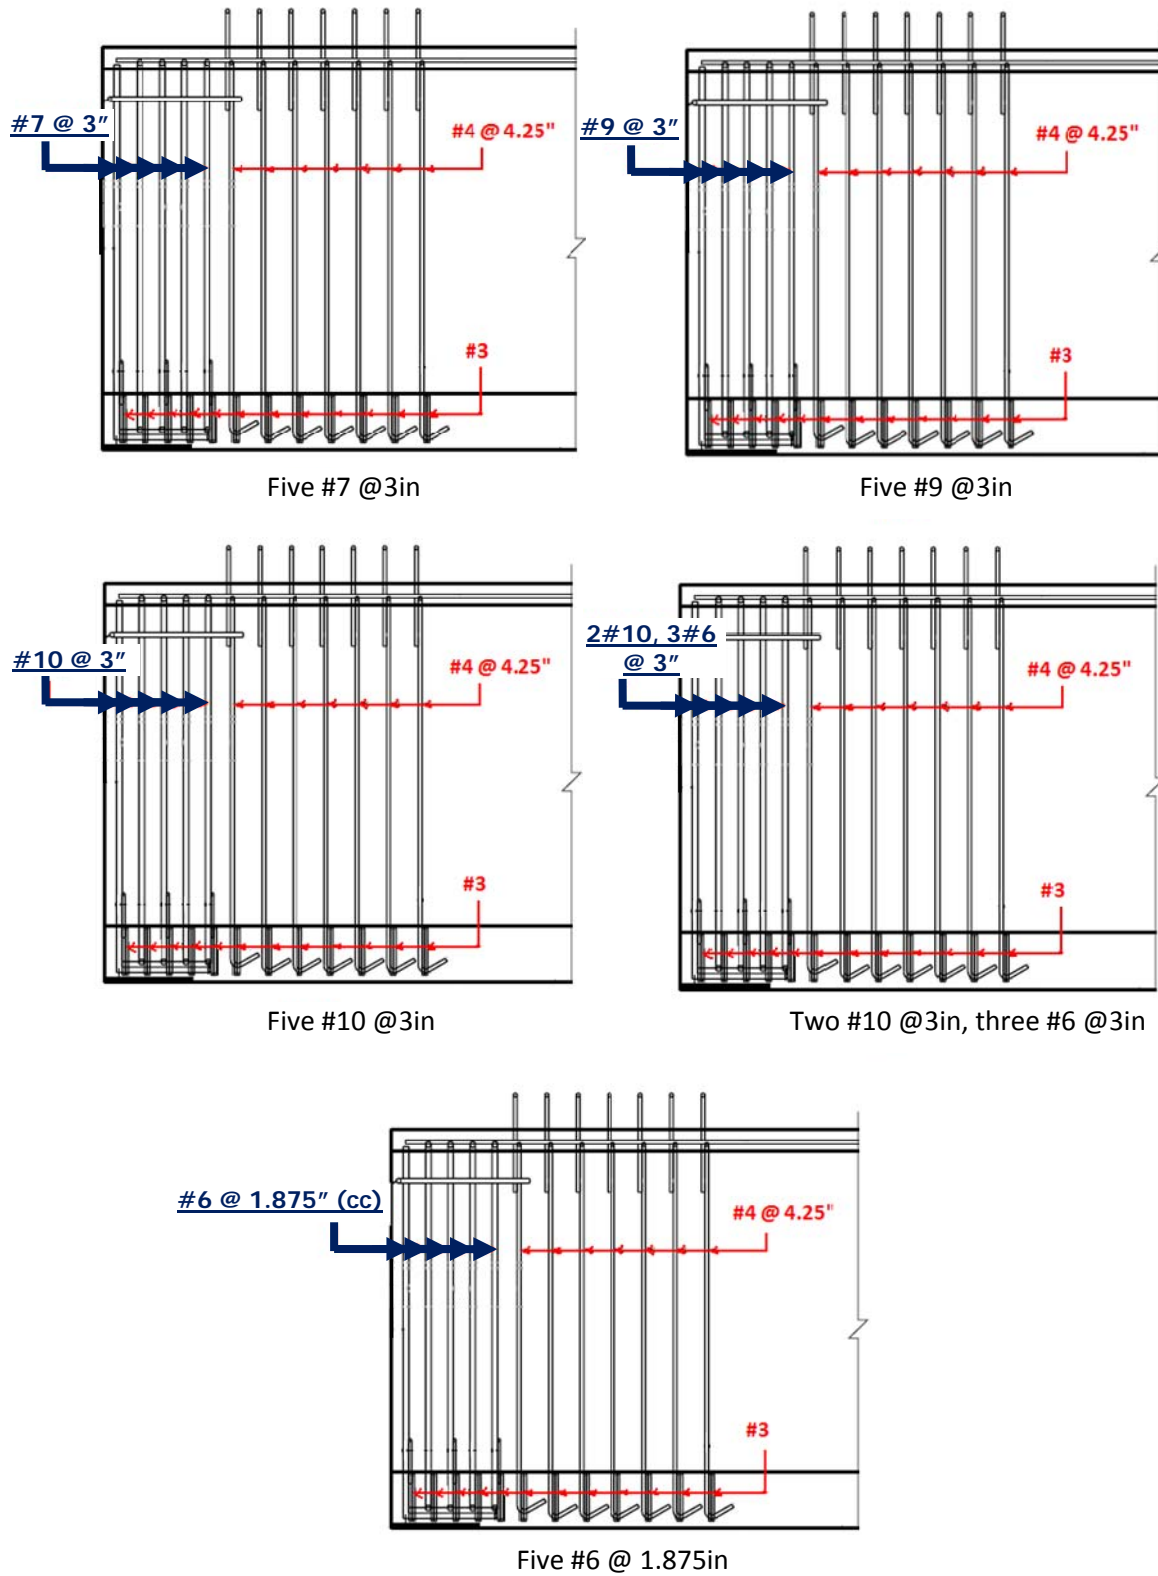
Elevation views showing the modifications to the first set of standard vertical bars from the girder end.
